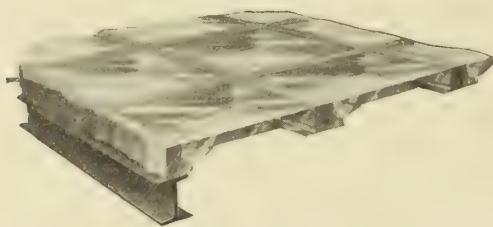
LUXFER NO. 98 FOR ROOF LIGHT, FLOOR LIGHT OR SKYLIGHT CONSTRUCTION
